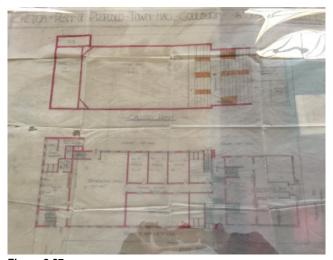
Sketch plans of proposed Goulburn Town Hall extension Source: Goulburn & District Historical Society, Manfred & Son Architects practice files
